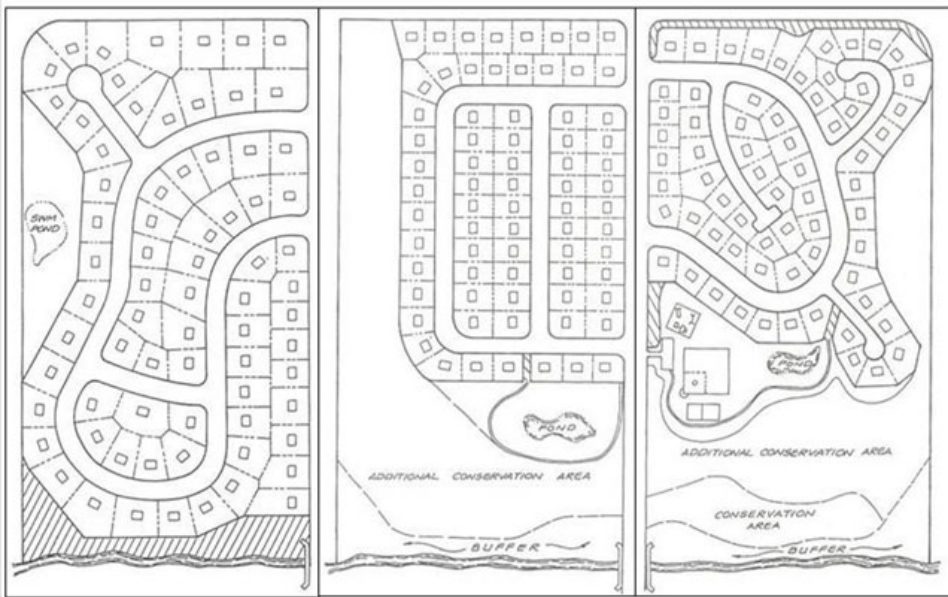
A conventional subdivision (left - 72 lots) with alternative layouts (center - 72 lots; right - 66 lots) implementing open space design.
